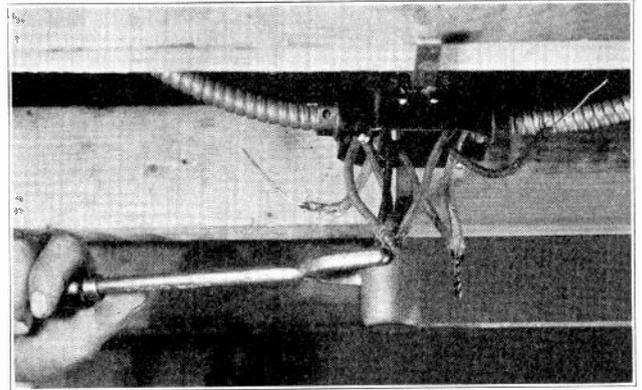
Pigtail splices can be quickly and conveniently soldered by dipping in molten solder as shown.
